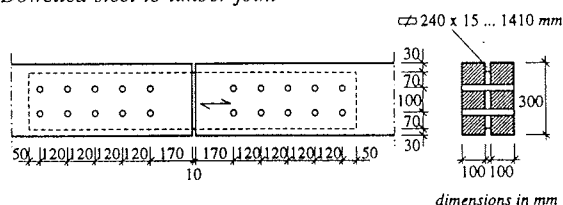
Dowelled joint with centre member of steel. Dimensions in (mm).
